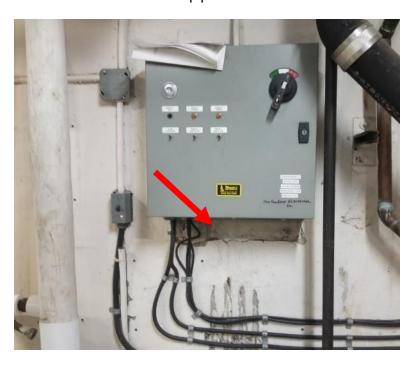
Basement, B-6, around emergency panel A on west wall, 1 square metre poor condition wall textured plaster.
